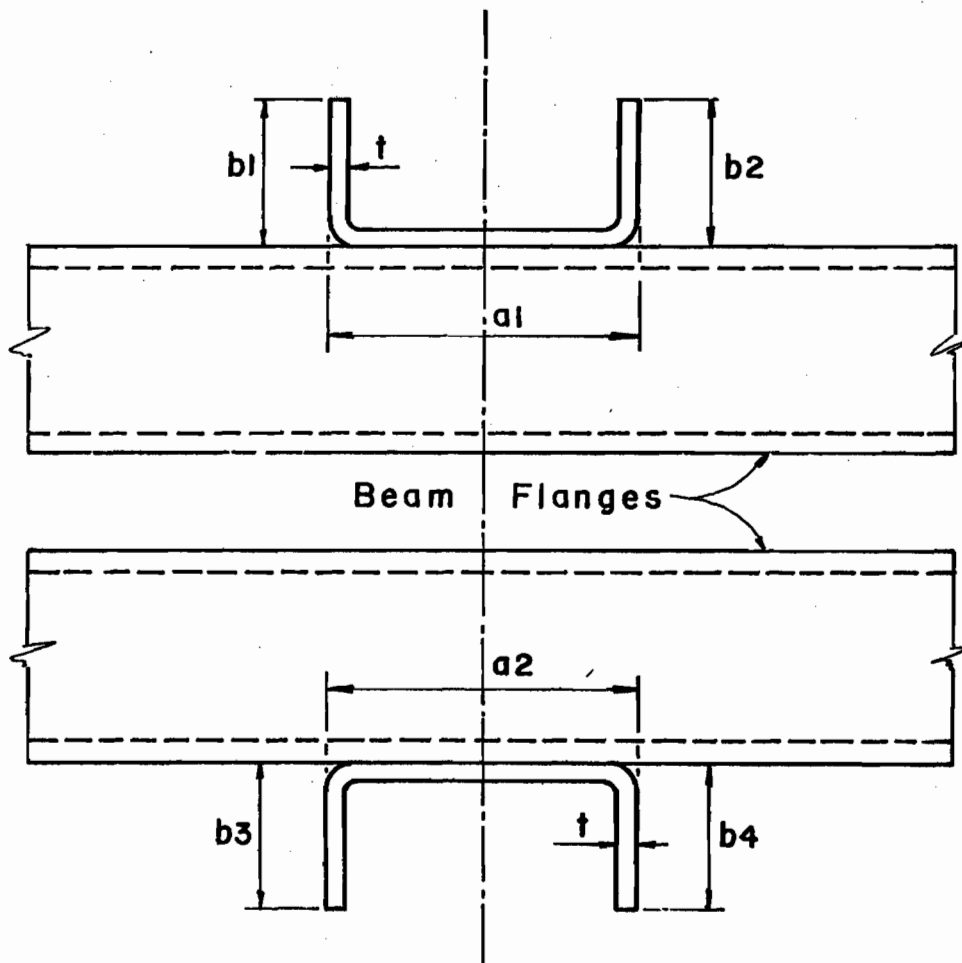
Dimensions of Cold-Formed Steel Transverse Stiffeners
